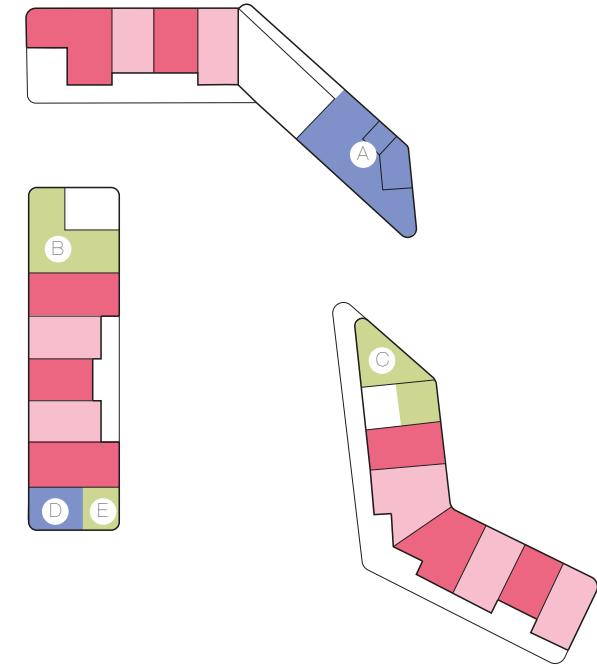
Situation Plan 1:500 (scaled to 1:1000)
